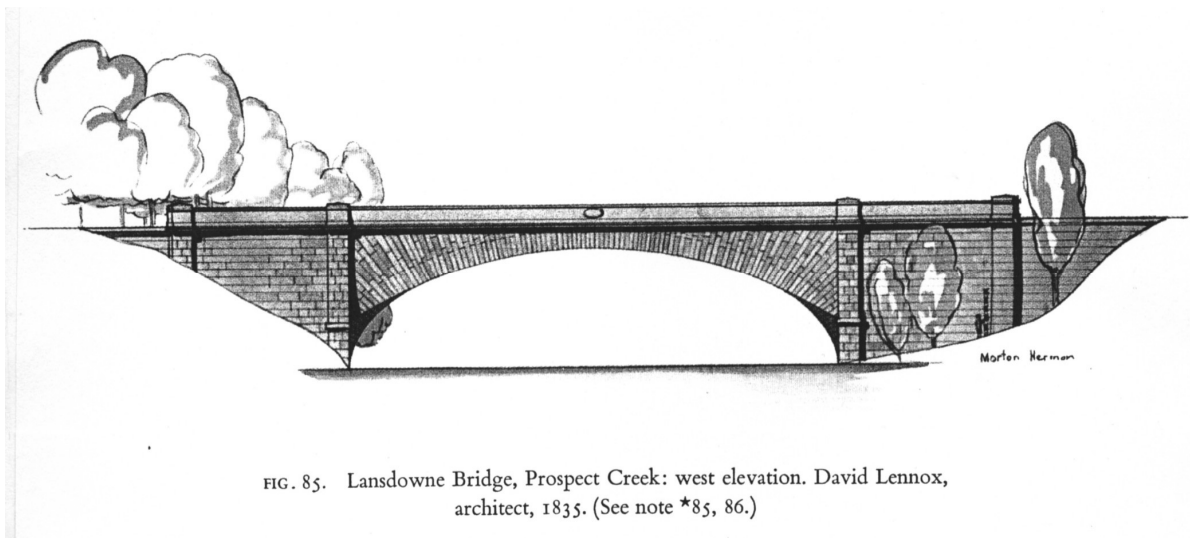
Lansdowne Bridge, Prospect Creek: west elevation. David Lennox, architect, 1835. (See note *85, 86.)
